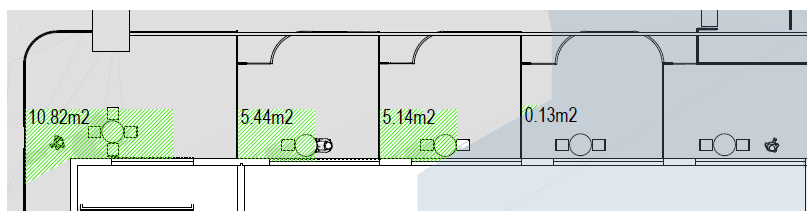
Retained solar access (shown in green, with 9am at top and 3pm at bottom) to the ground floor areas of SPOS of dwellings TH06 – TH10 (Applicant submission, December 2020)
